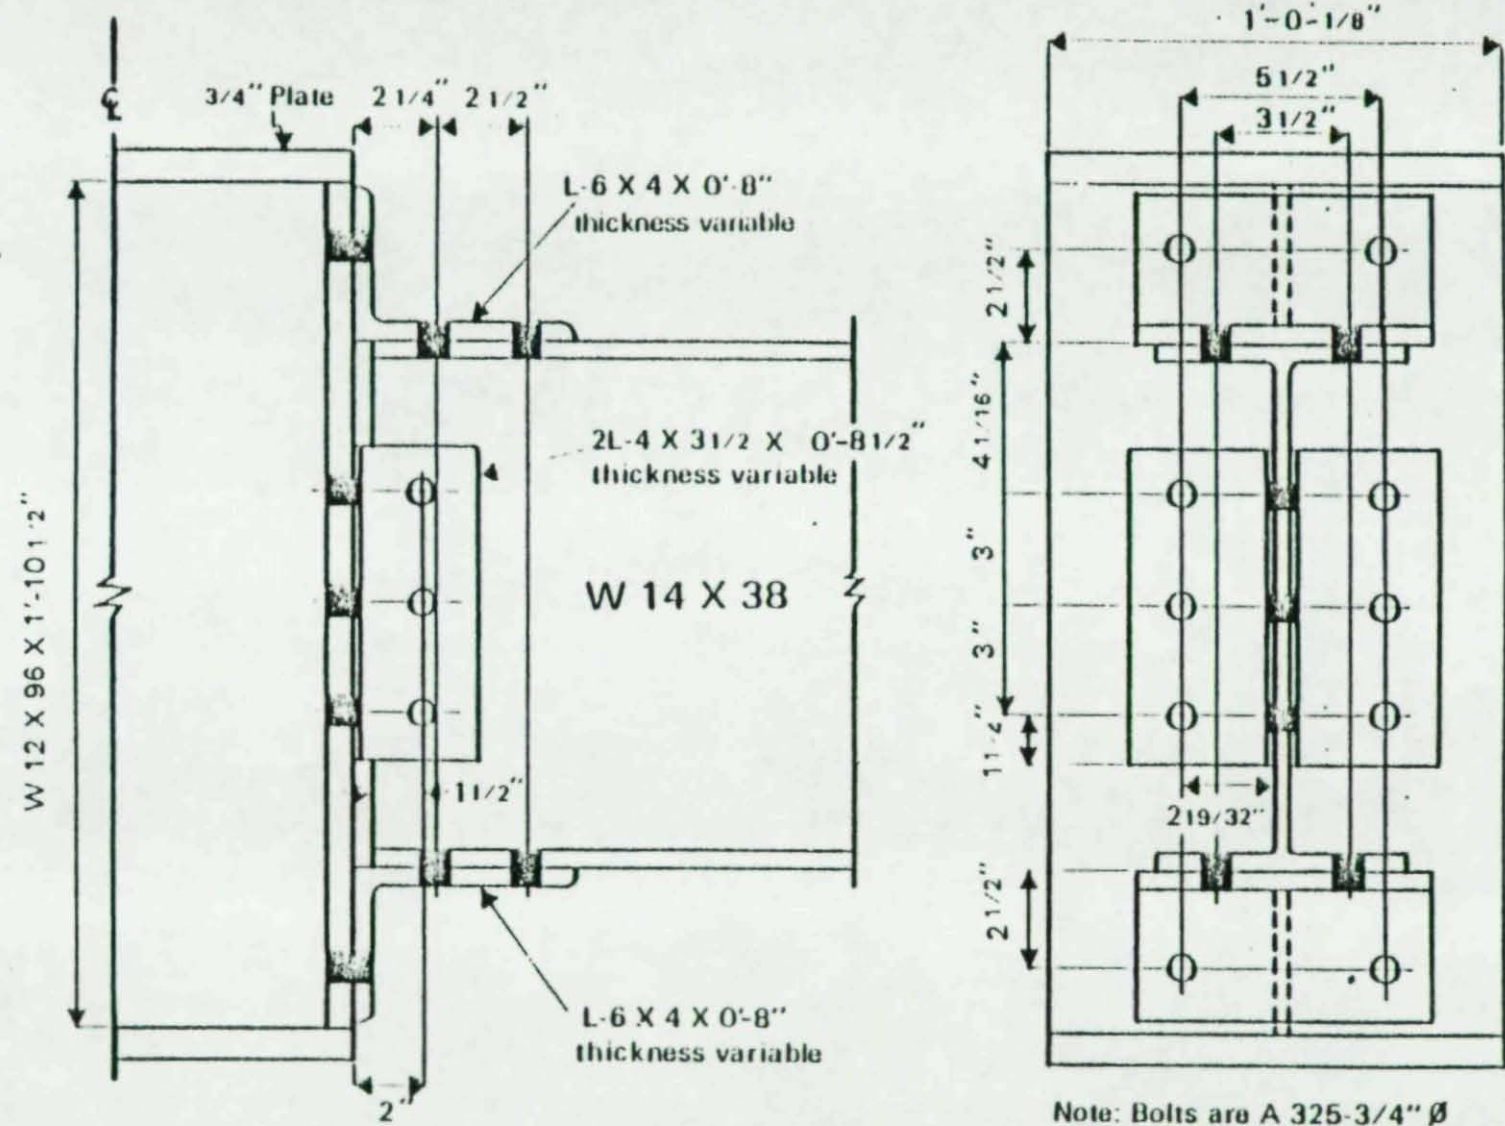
DETAILS OF CONNECTION FOR W 14 X 38 BEAM
